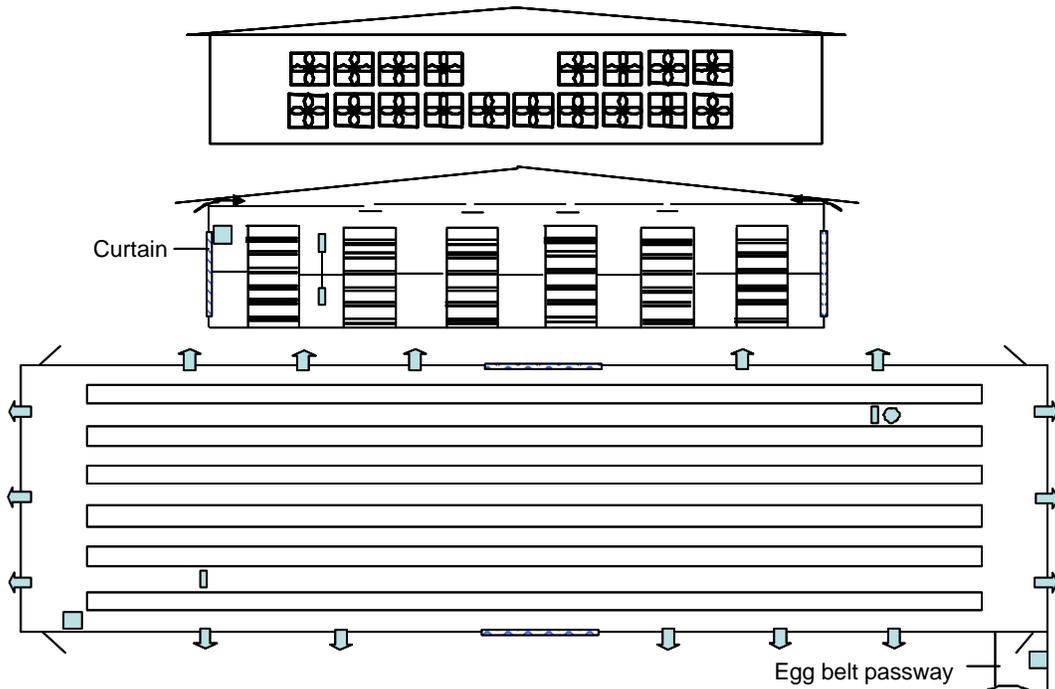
Schematic layout of the PA manure-belt layer house showing the end wall, cross-section, and floor plan of the house and the sampling locations (symbols are the same as in fig. 1).
